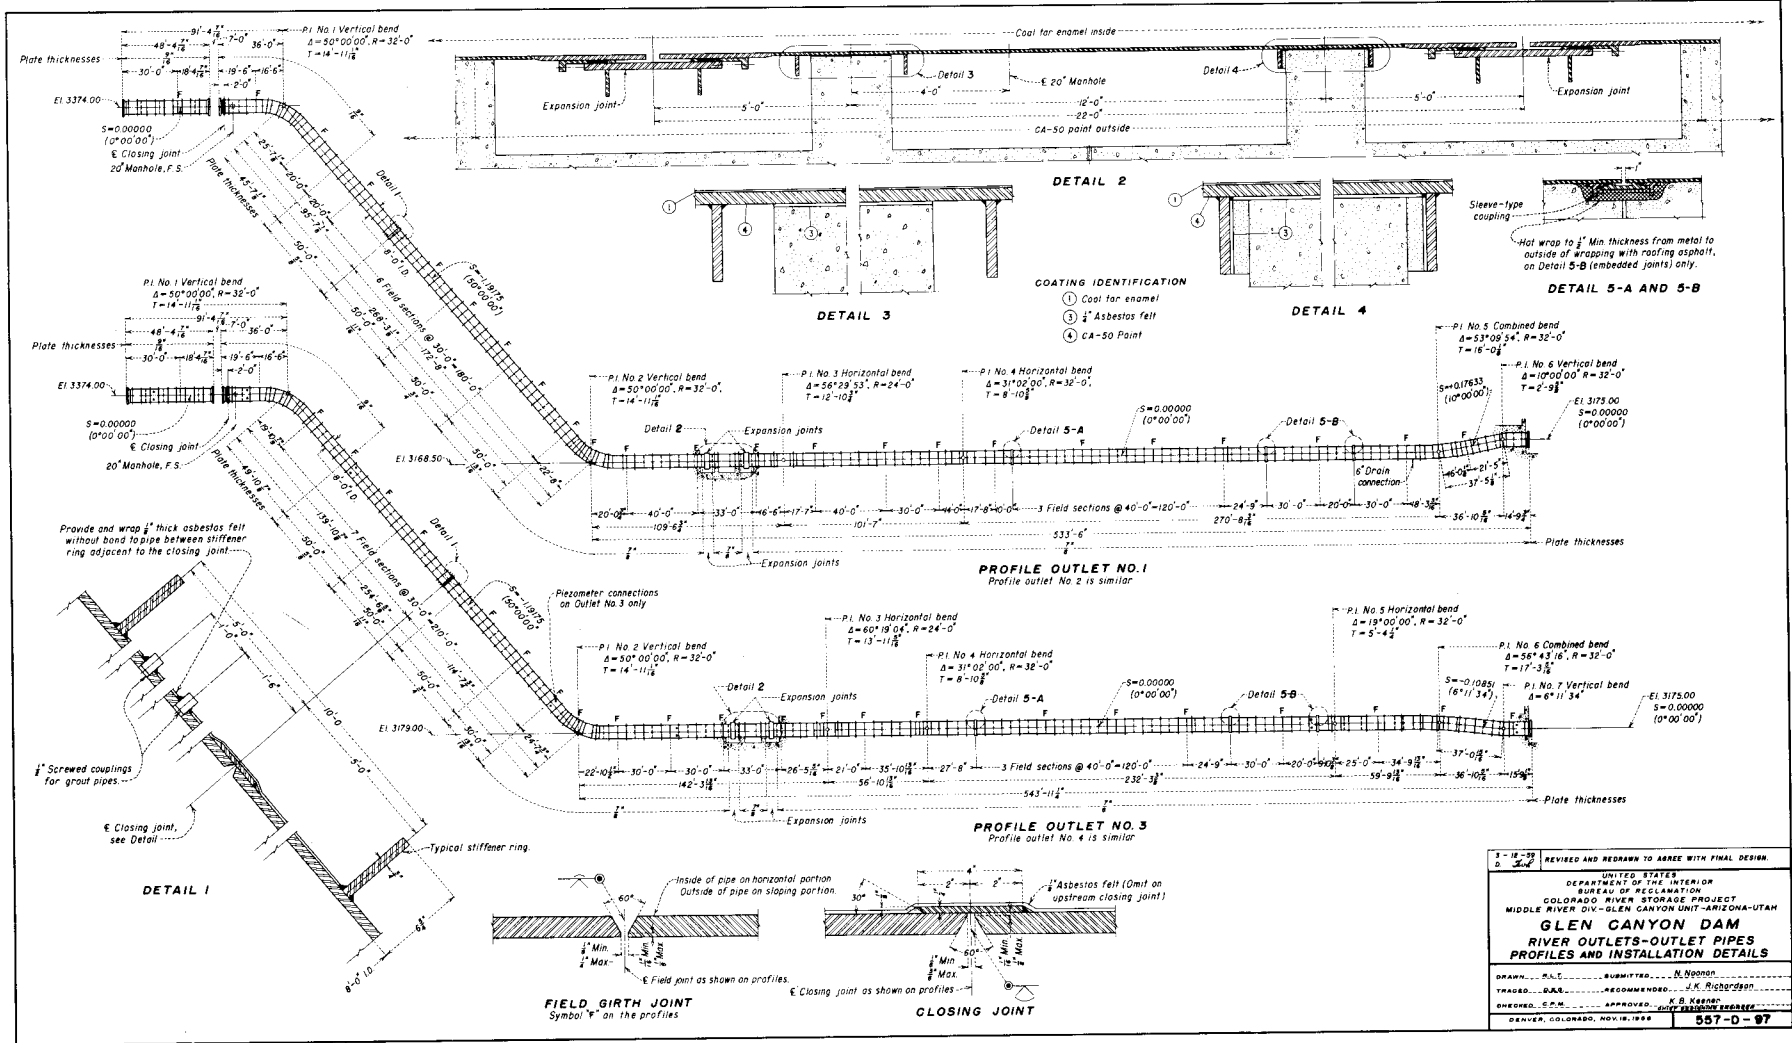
Dam river outlet pipes—Profiles and installation details.
